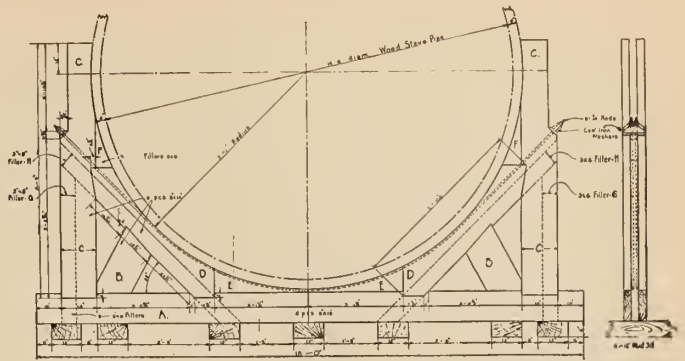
Detail of Saddle Construction for Wood Stave Pipe.
